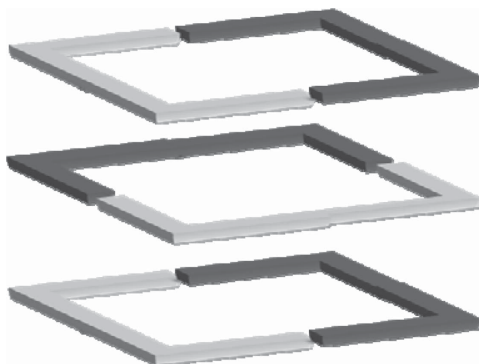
Building system used alternating the available U-shaped formwork (Vegas & Mileto).
